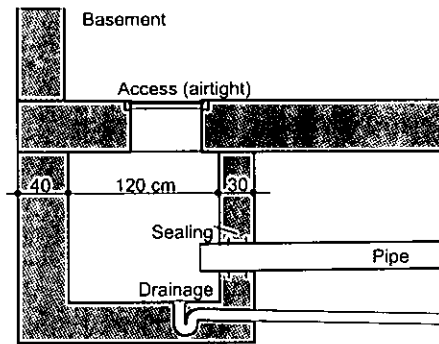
Section through concrete distribution duct of a large ground coupling system. The pipes have to allow for thermal expansion
